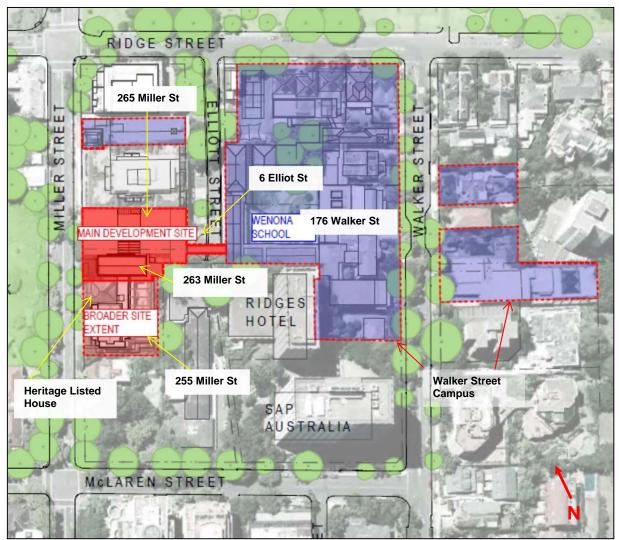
Wenona School Campus Existing Site Layout and Development Site
